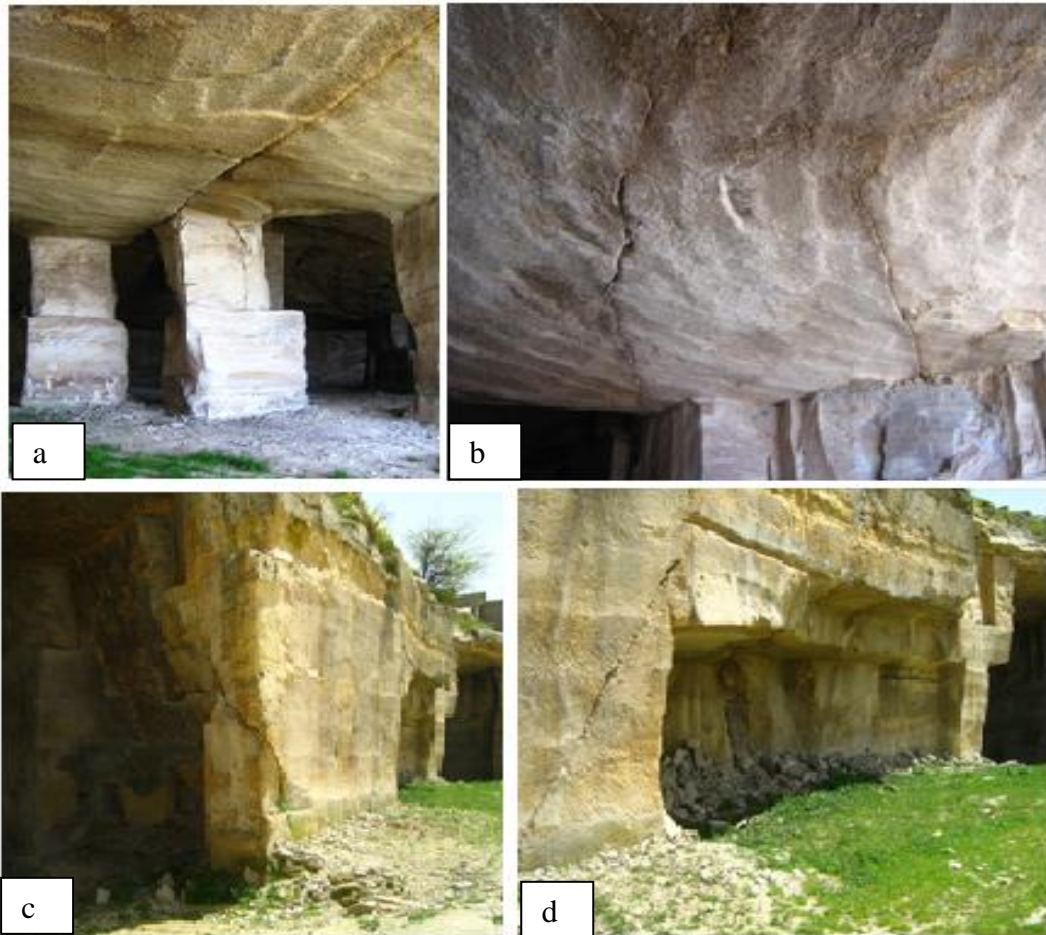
Cracks observed in the roofs and rock pillars of the caves and alteration.
